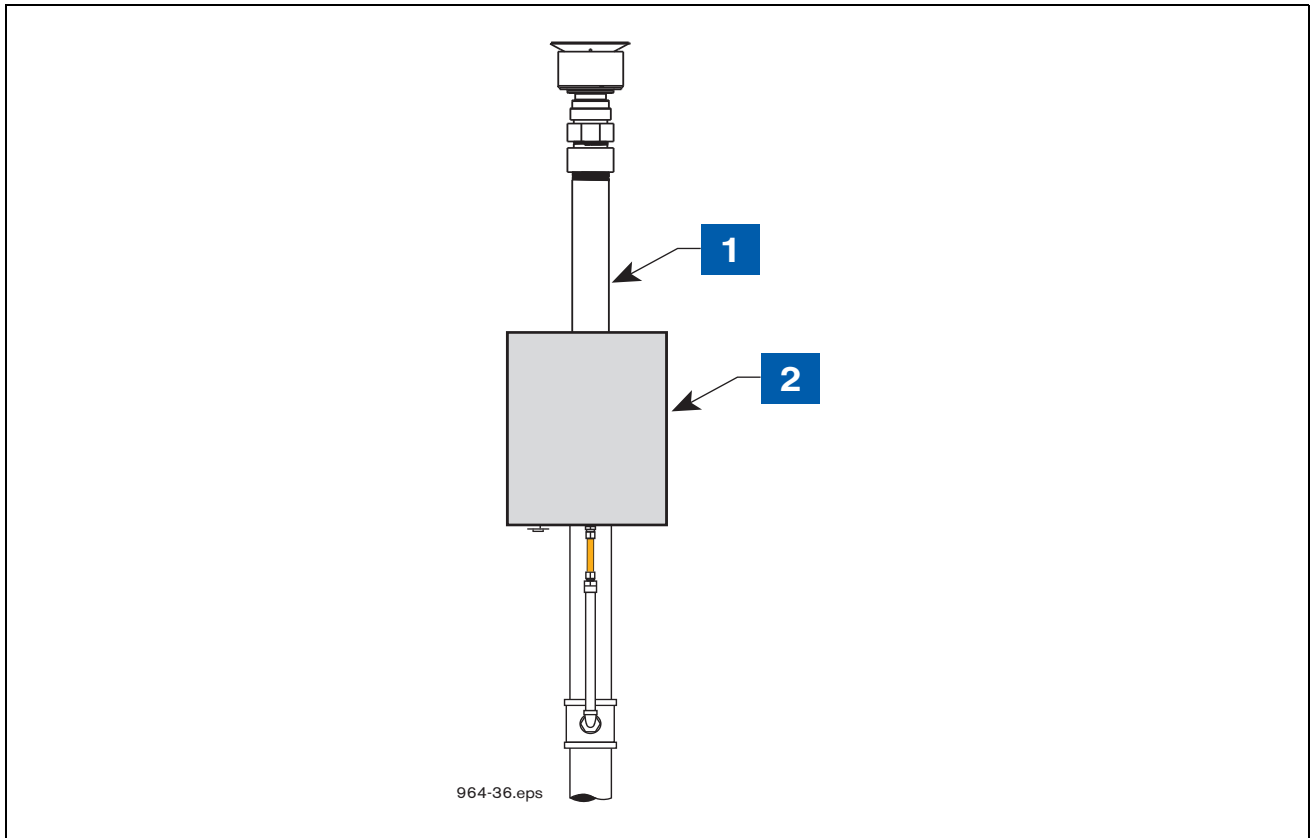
VRPS Mounted In Universal Enclosure On The Vent Stack
